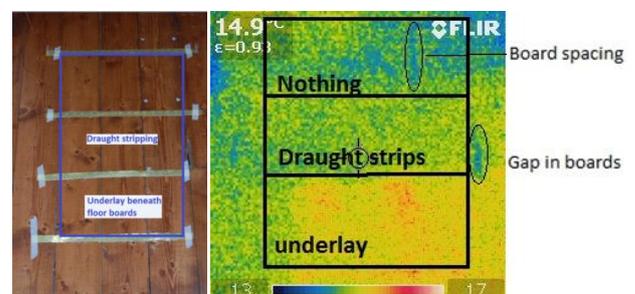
Left: Photograph of section of floor tested subdivided into three sections: top – unchanged; middle – draught stripping between floor boards and lower section – underlay beneath floor boards. Right: thermal image of the floor section showing the varying thermal performance.
